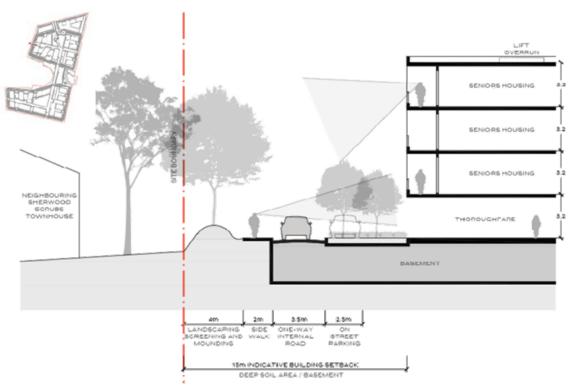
Indicative section from Sherwood Scrubs Townhouses to the west
